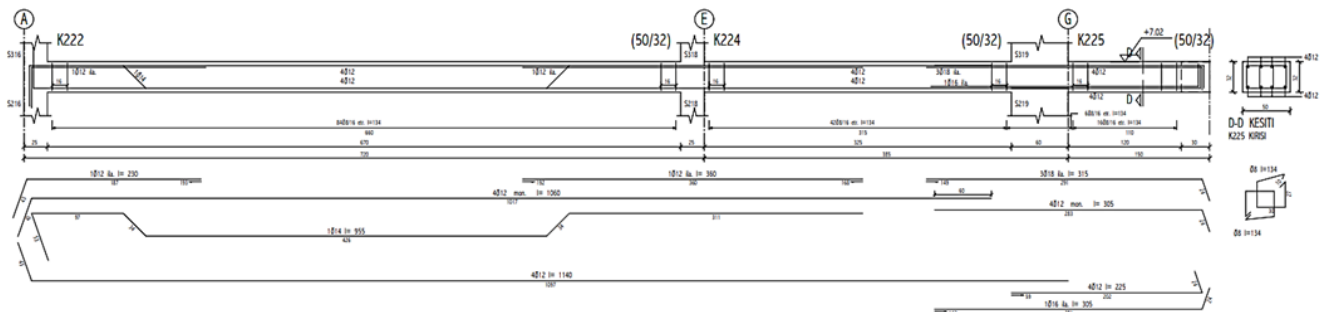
Reinforcement details of K222, K224, and K225 beams.
